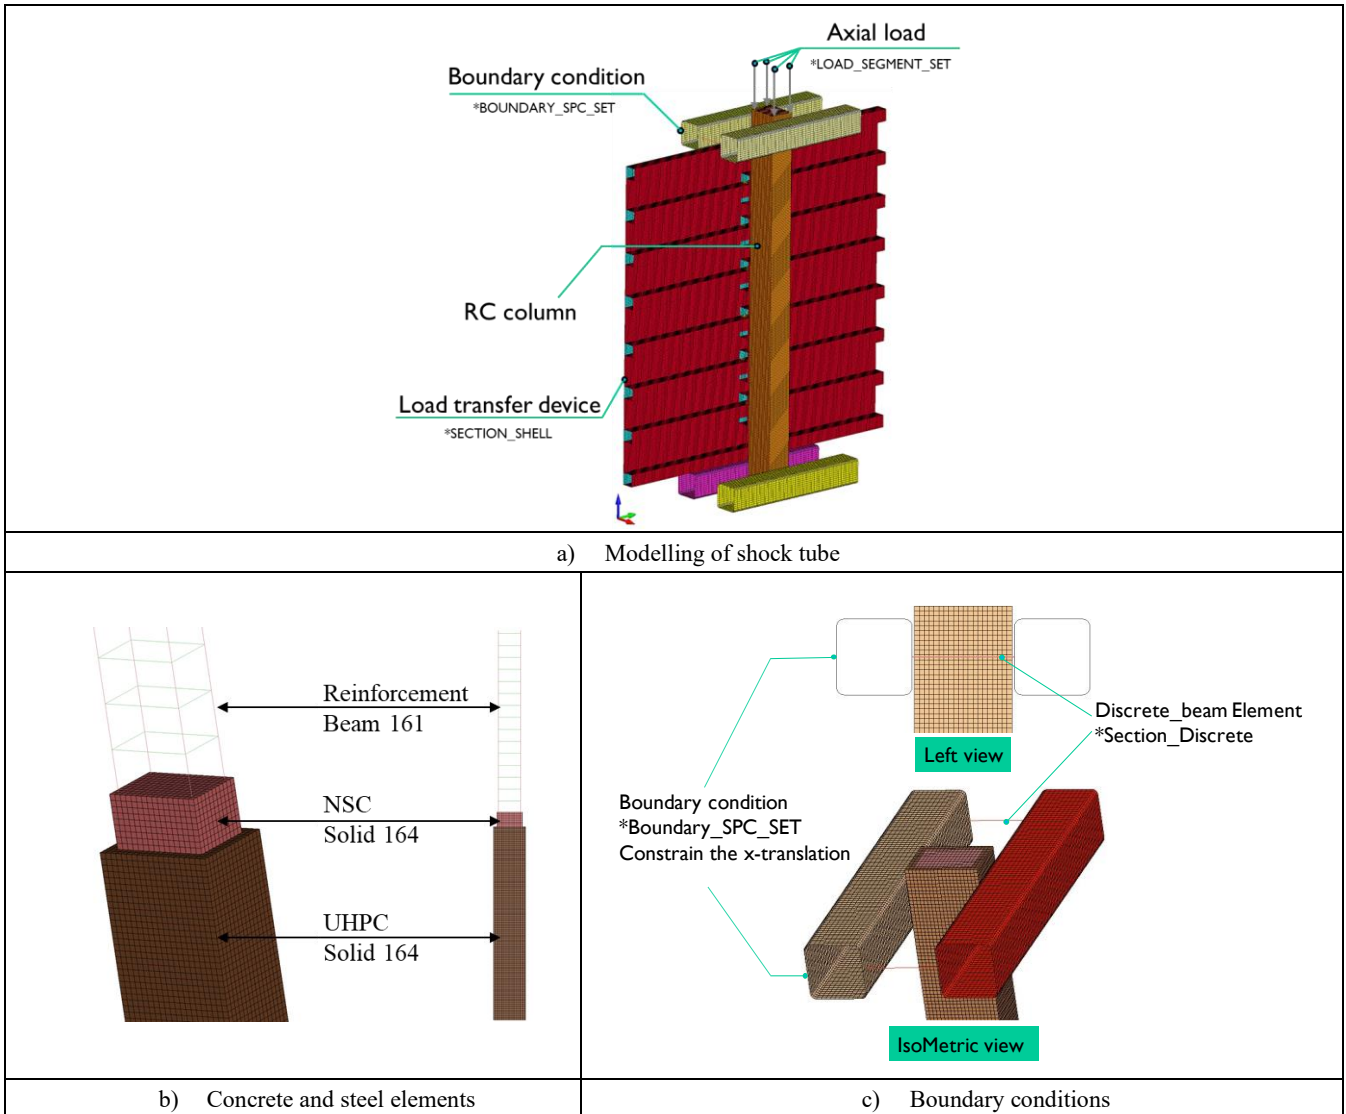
10 FE modelling: 3D model, concrete/steel elements and boundary conditions
